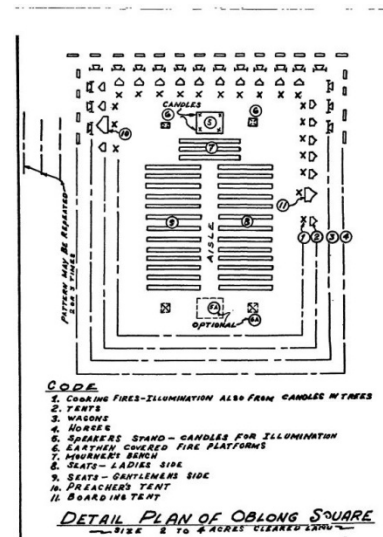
Detail plan site organization. Fires for cooking and illumination were to be placed in front of the tents.. Johnson, *The Frontier Camp Meeting*.¹²
